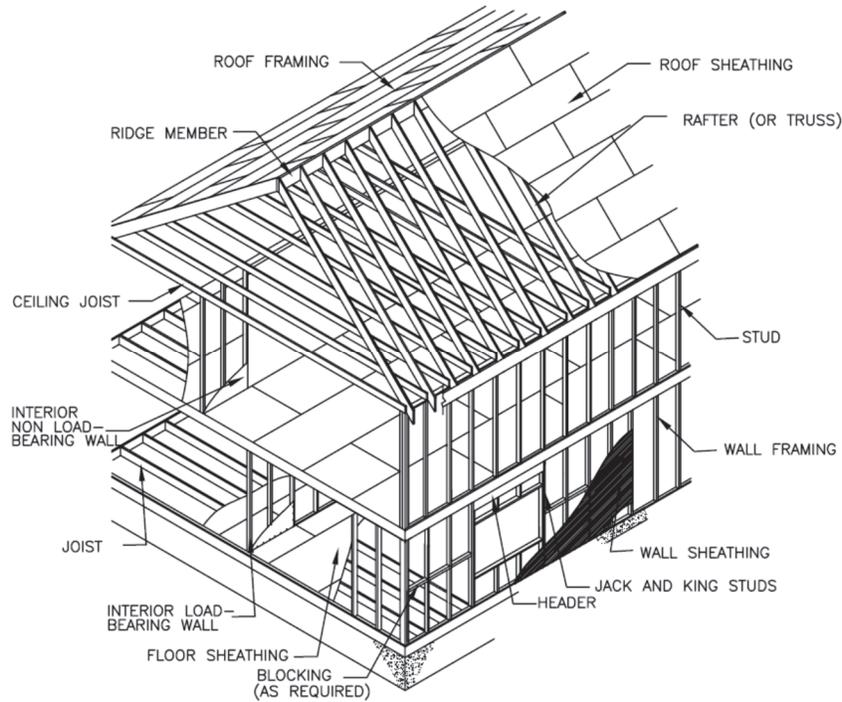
Elements of a typical wood-frame house (image credit: U.S. Department of Housing and Urban Development).
